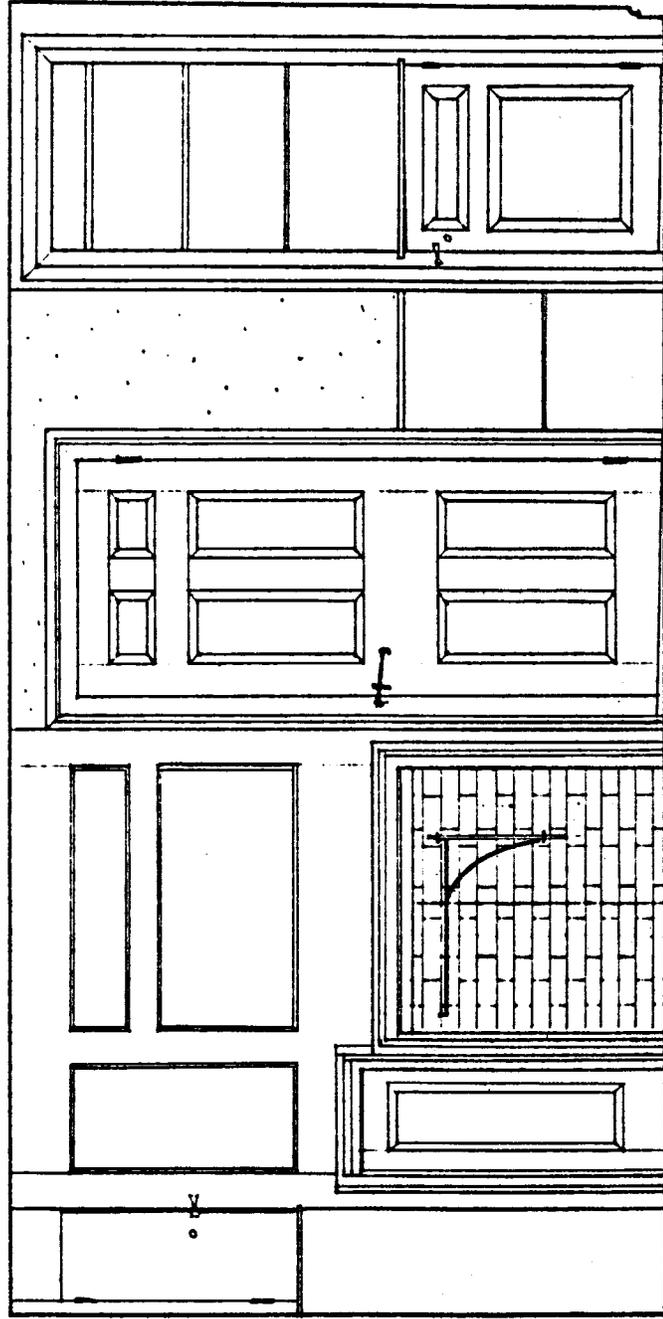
Atwood-Higgins House: West Kitchen, South Wall.
